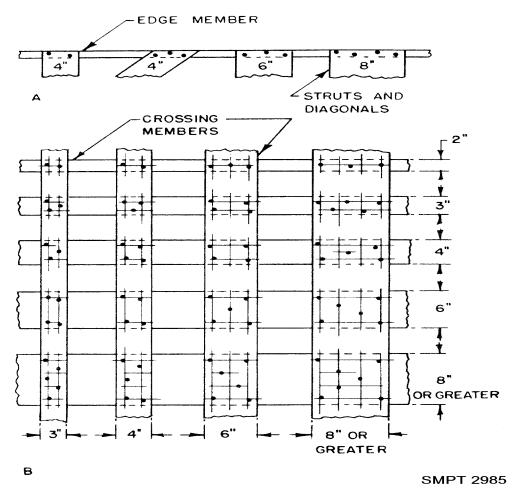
Nailing patterns. (All widths nominal). Similar patterns shall be used when boards cross at angles other than 900.
